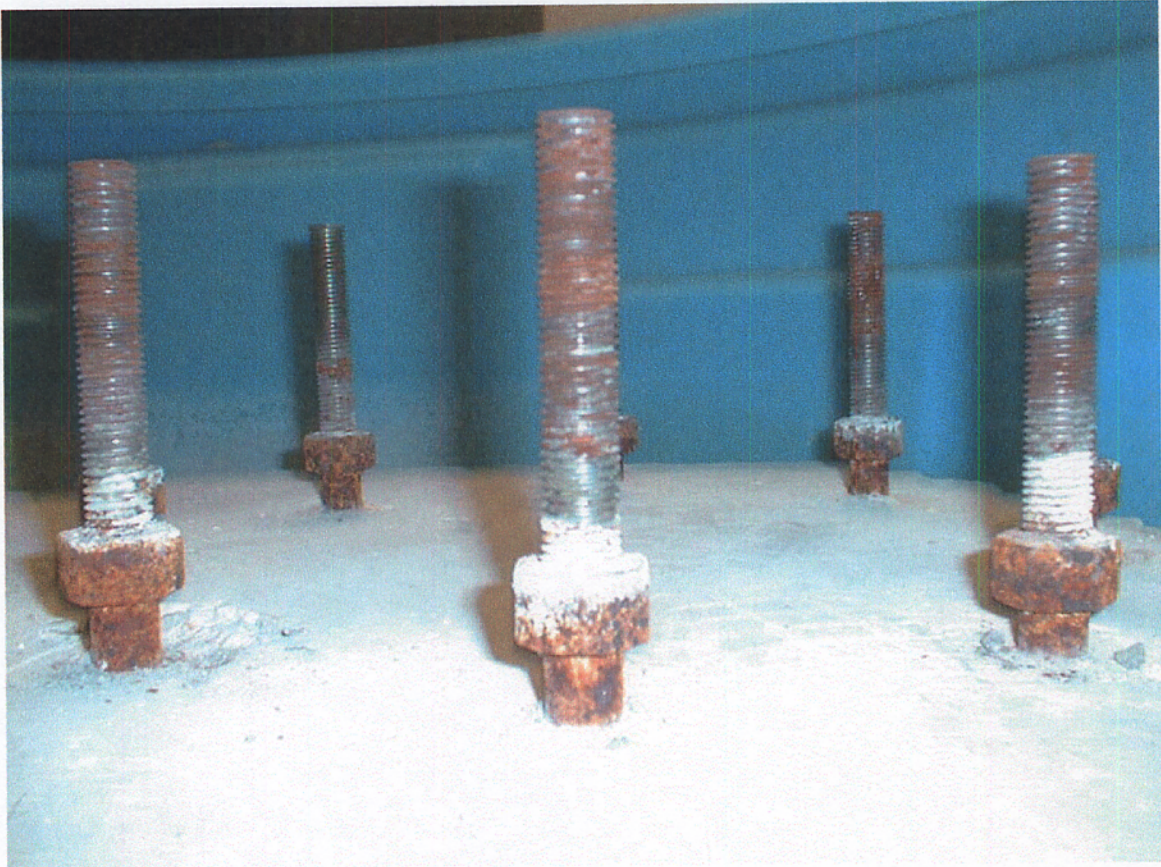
Picture Of Anchor Bolts In Base Plate Arrangement Without A Grout Pad
